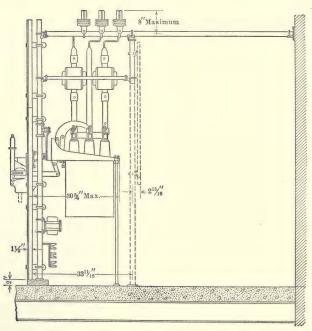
Arrangement of 2300-volt Switchboard with Switches Mounted on the Pipe Work Supporting the Panels.
